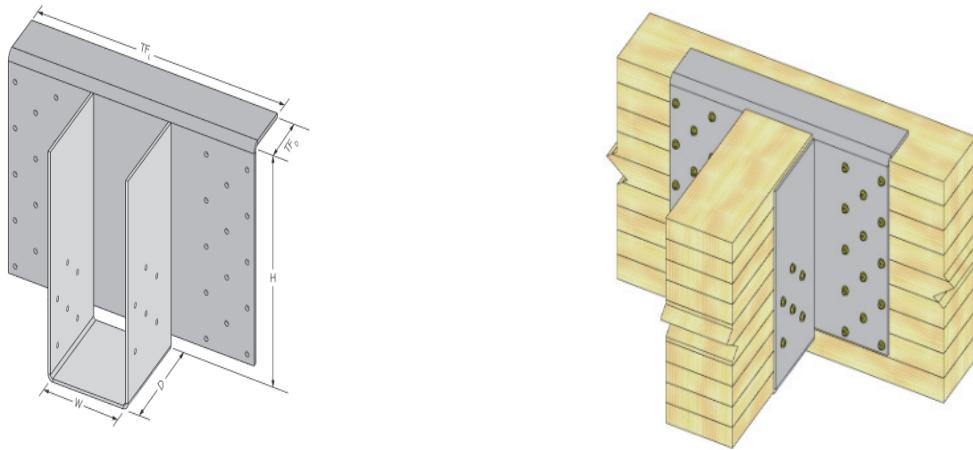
KEGQ TOP MOUNT GIRDER HANGER AND TYPICAL INSTALLATION DETAIL
